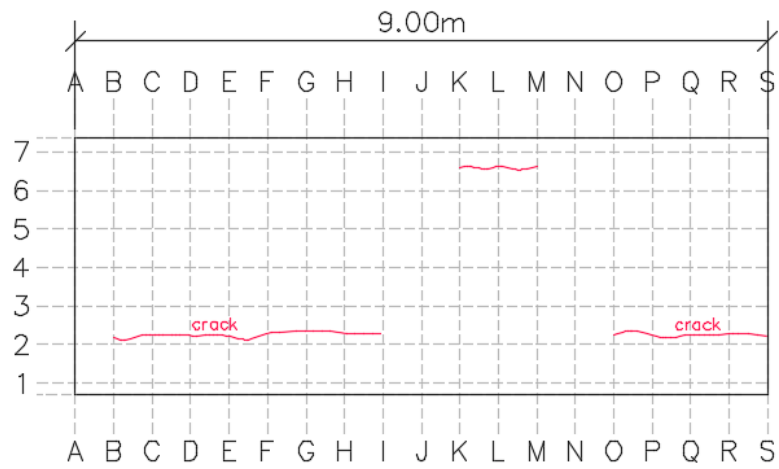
Damage location based on visual inspection on span no. 6
